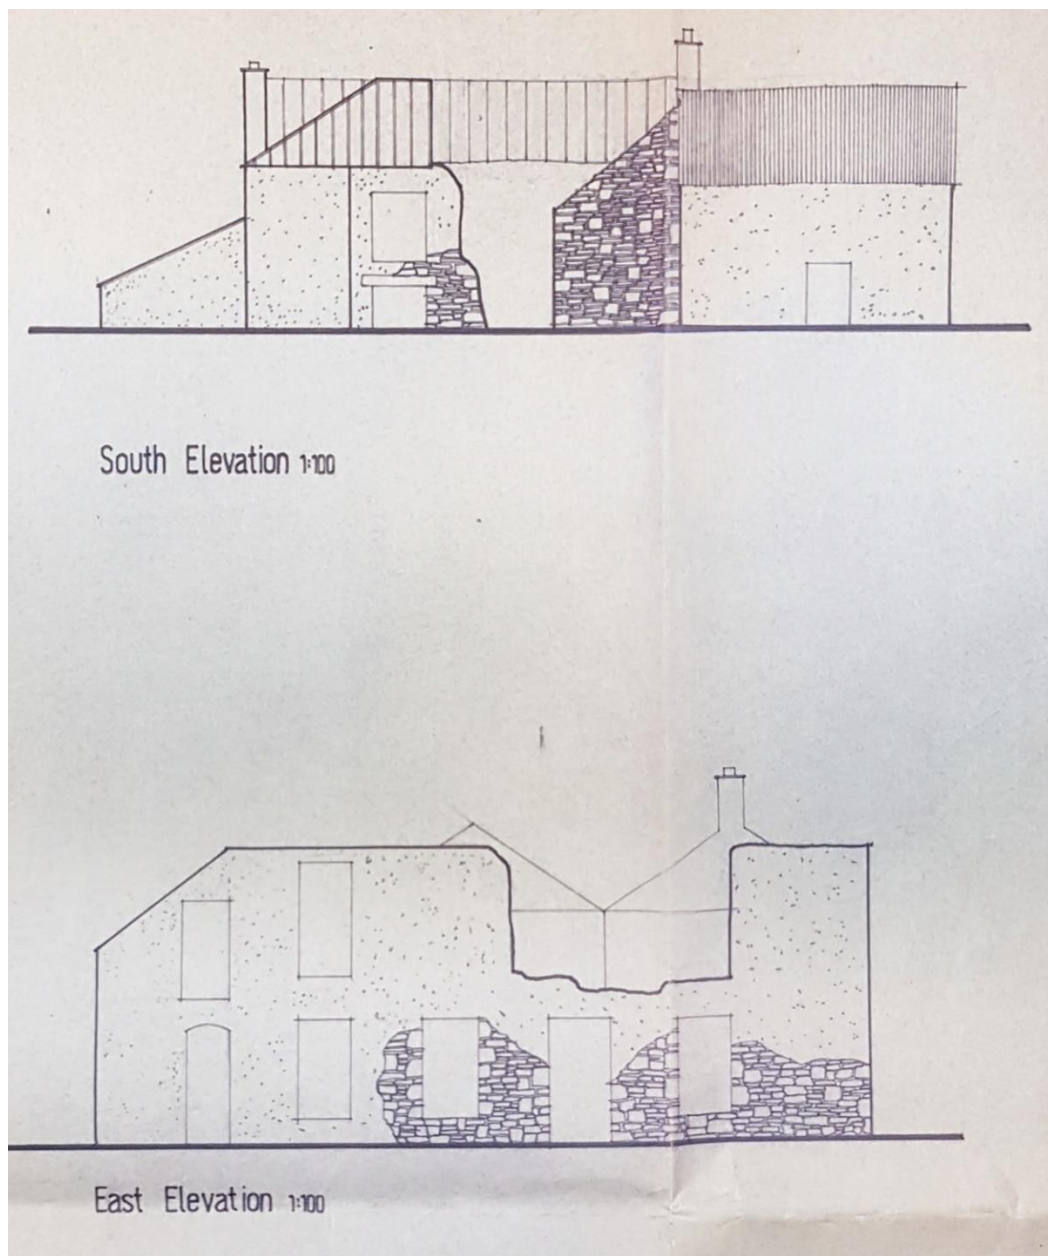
South elevation of The Count House and Captain's House and east (front) elevation of The Count House drawn in 2000 prior to rebuilding works. Drawings by Christopher J Pryor Architectural Services.
